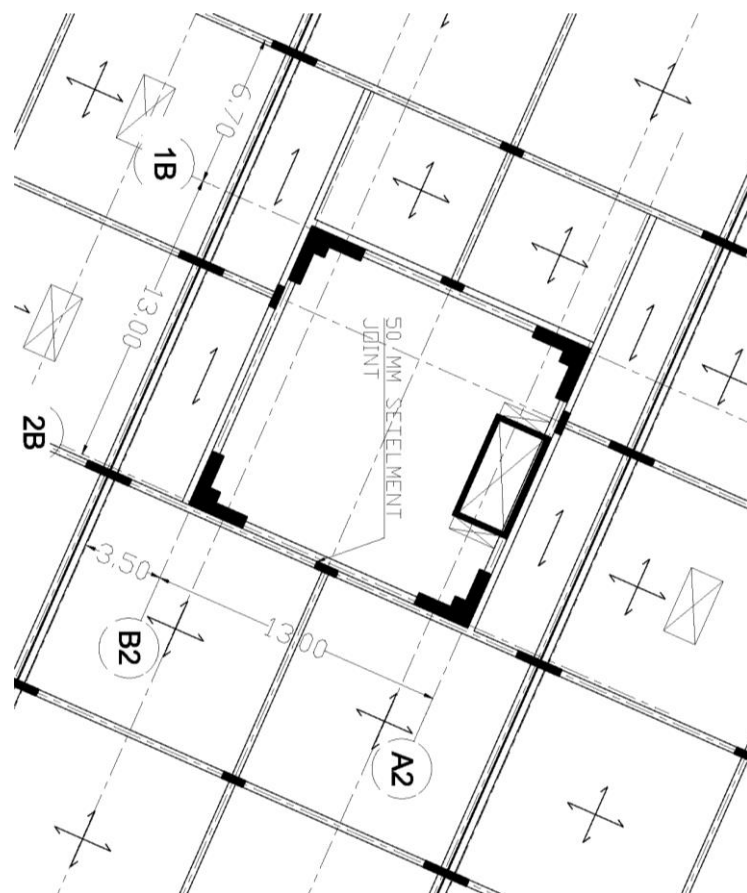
partial plan for the Structure of the observation tower at level (1)
